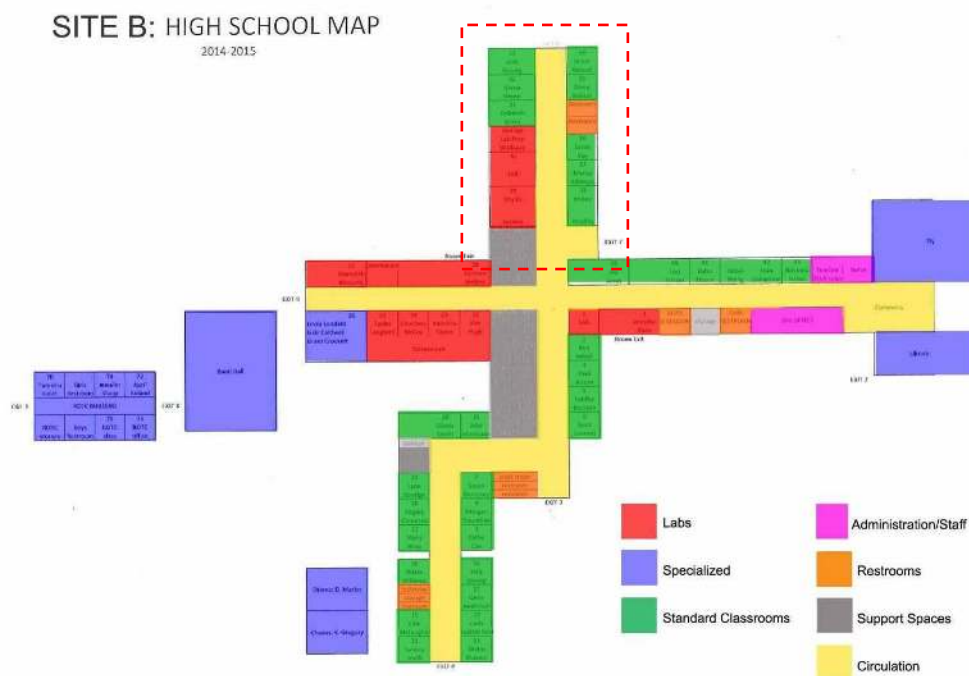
A: Site B – High School Facility Floor Plans. The red dashed rectangle is the English wing addition.
